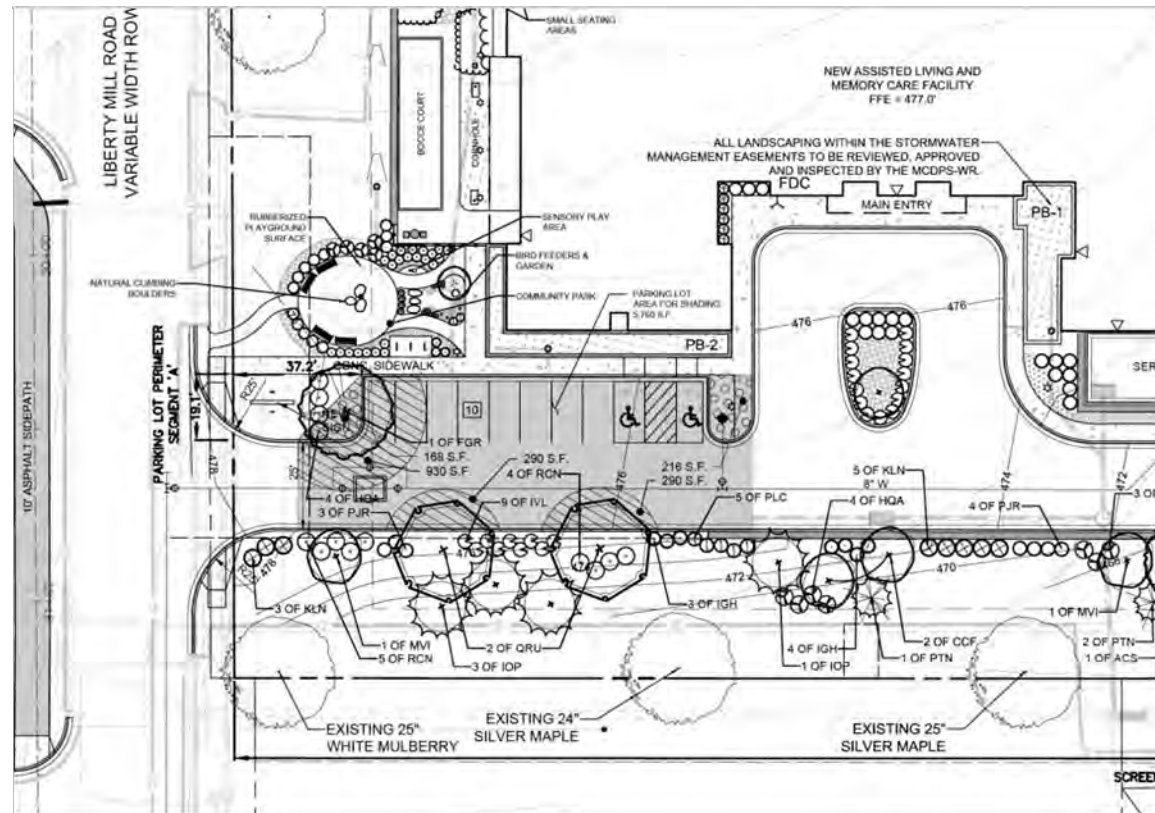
Landscape plan for the surface parking lot (shaded) near the main entrance of the building
